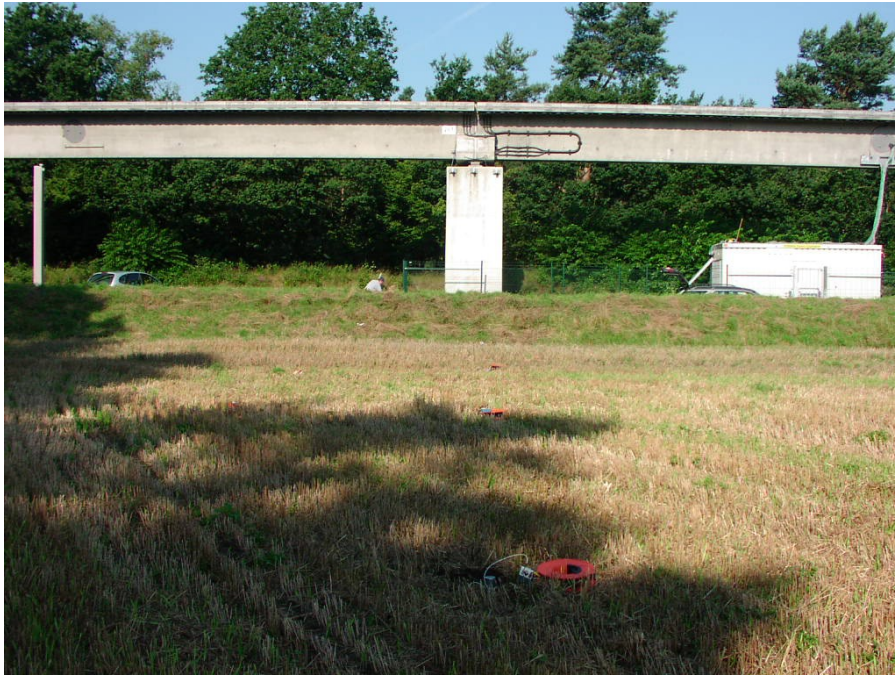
Ground-borne Vibration Transducers at Hybrid Beam 267
